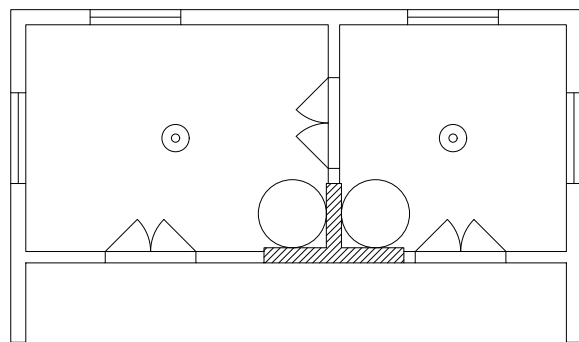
Floor plan layout of first small room, 1:100, by Ragnar Östberg. An interior which has several openings can evoke a discomfort and also bring a fragile and vacuous impression of the building.
